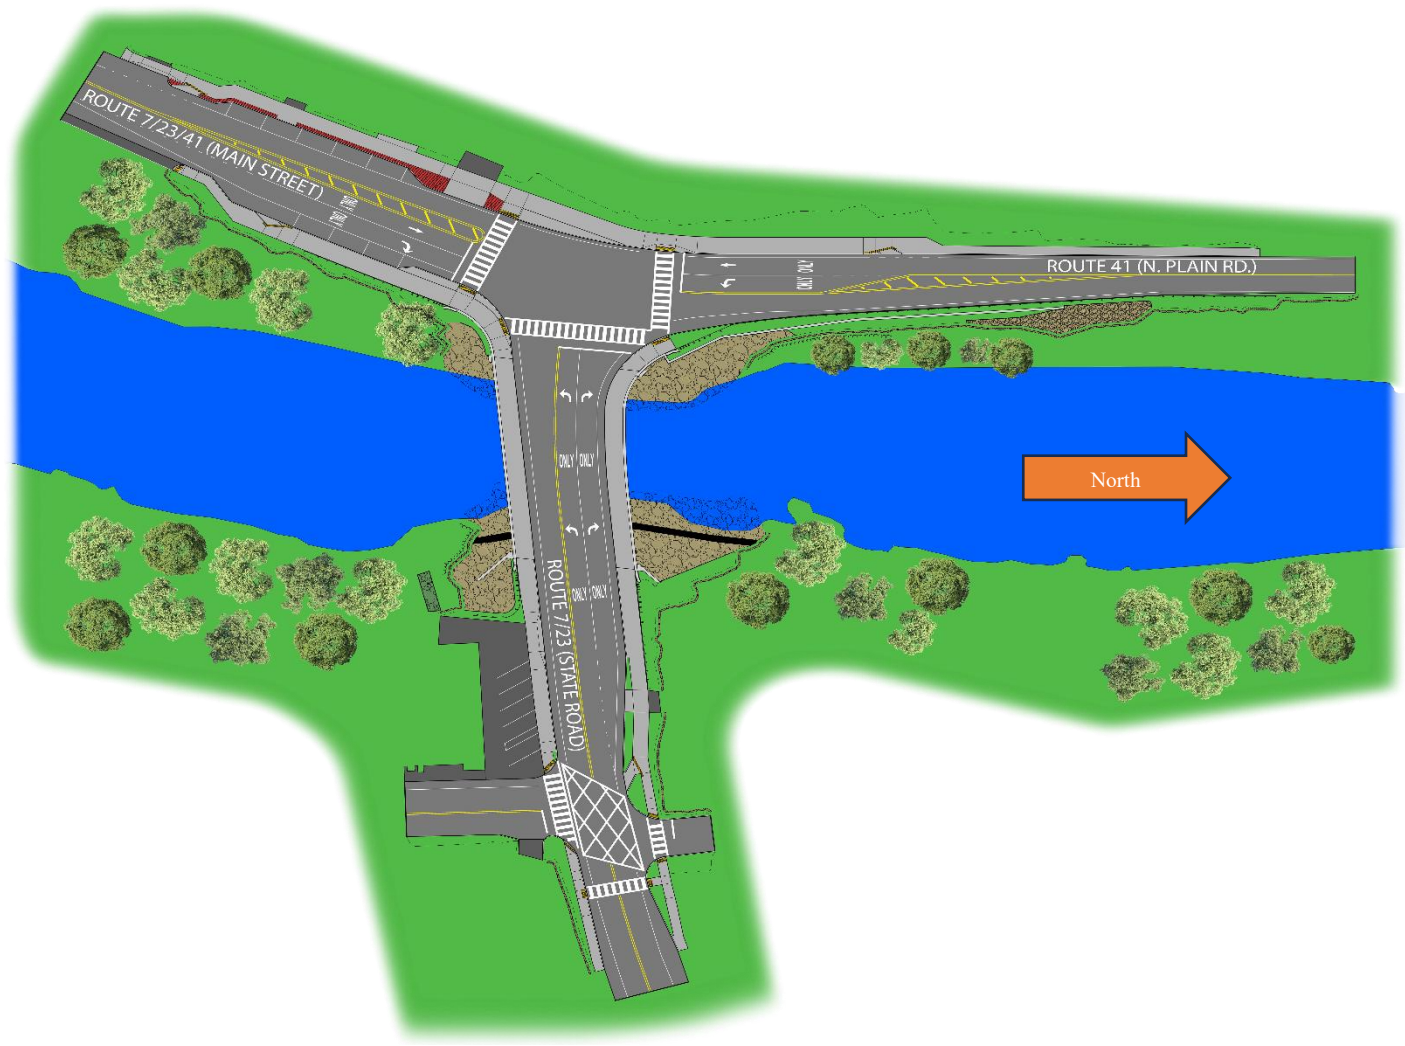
Proposed Roadway Realignment and Intersection Improvements
